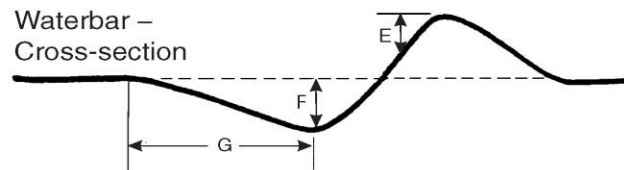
Waterbar construction for forest or ranch roads with little or no traffic. Specifications are average and may be adjusted to conditions.
